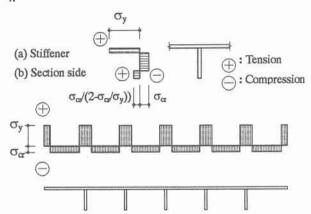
Residual stresses in each side of hollow rectangular section of steel tower
